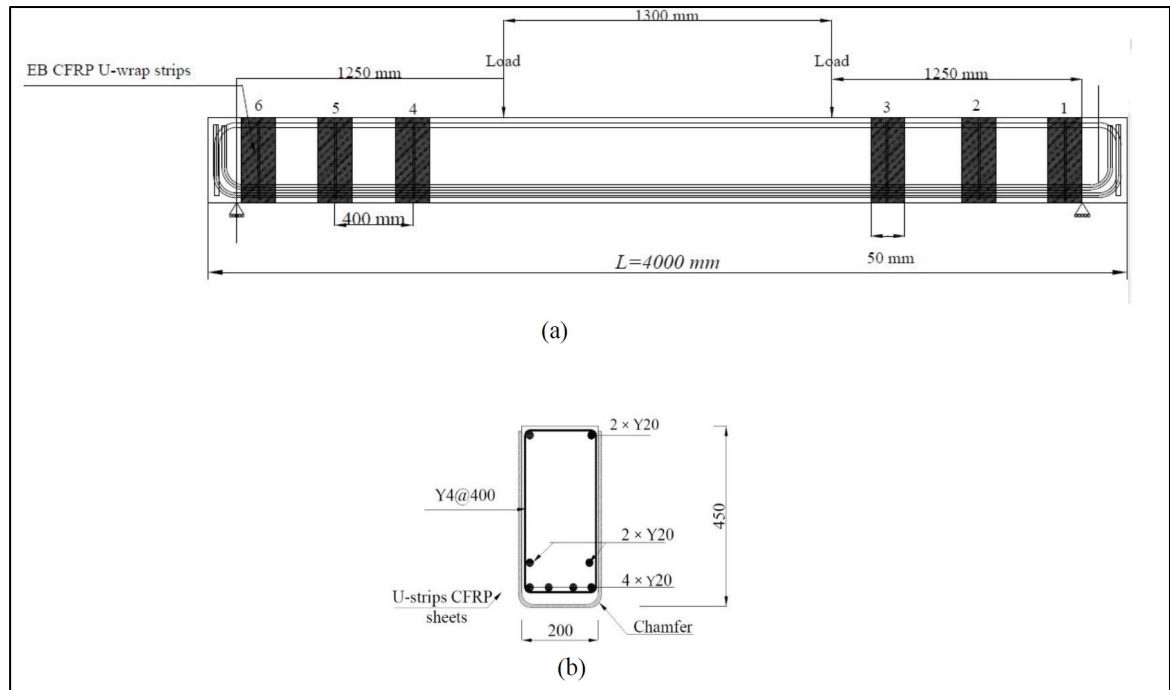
Details of beams: (a) Cross sections of the specimens (mm); and (b) Elevation of beam, and position of four points loading
